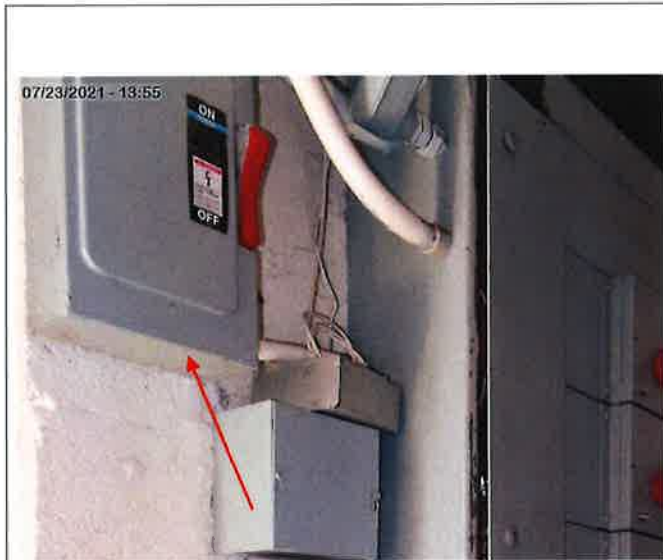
Disconnect switch not labeled to identify the load it serves (North building, roof cooling tower mechanical room)(Item #10.a)
